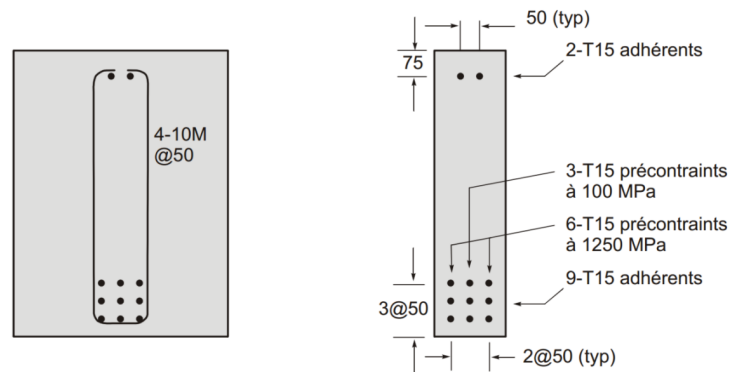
Reinforcing bars for the specimens R06-1 and R06-2
